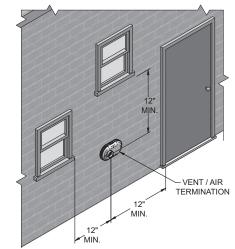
D Alternate SS Venting Arrangement -Typical Stainless Steel Sidewall Termination of Air and Vent w/Field Supplied Fittings, Utilizing a Hood Intake
